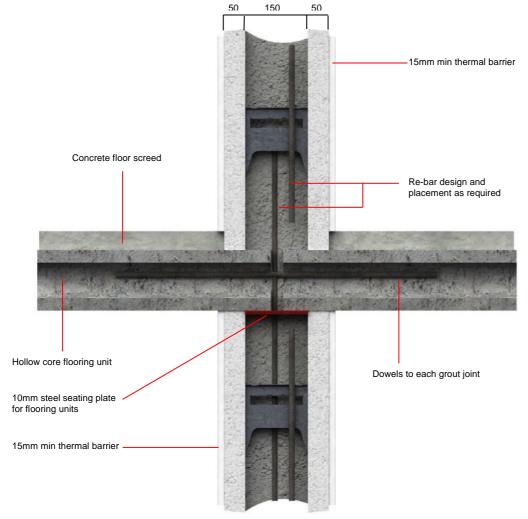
Precast Hollow Core Floor on 150mm Interior Wall
